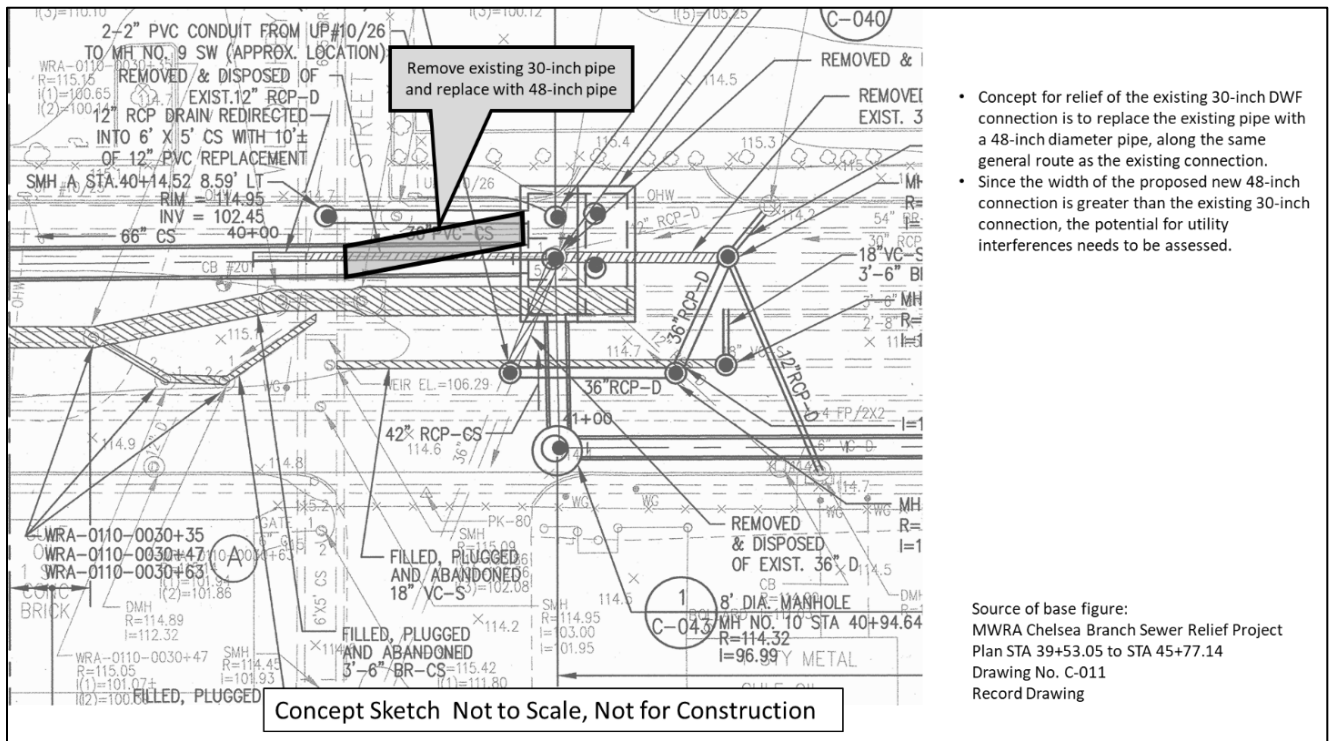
Concept Sketch Plan View of CHE008 Proposed DWF Connection
